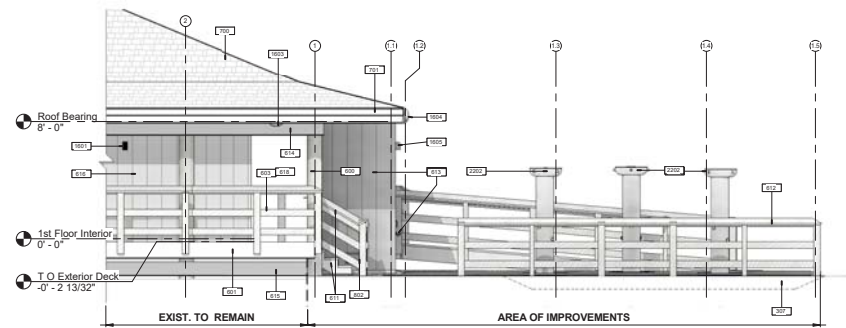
EXHIBIT A - Lowdermilk Facility Improvement Drawings S & S
